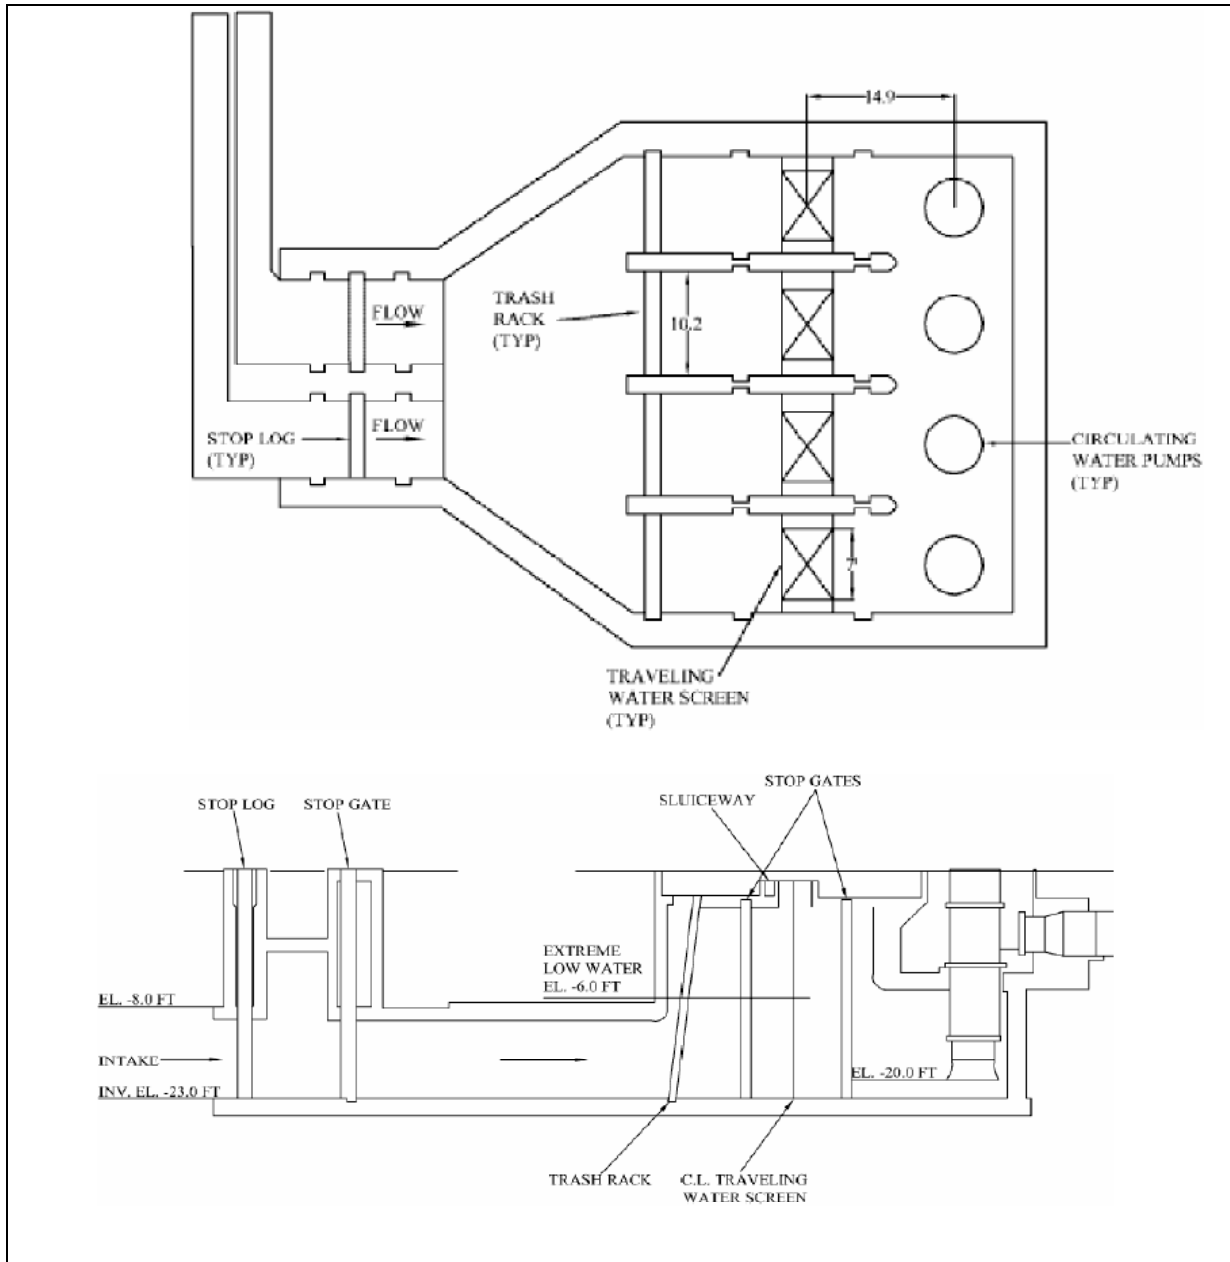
Plant 2 intake structure: plan view and typical cross section. (Metric measurement units not included.)
